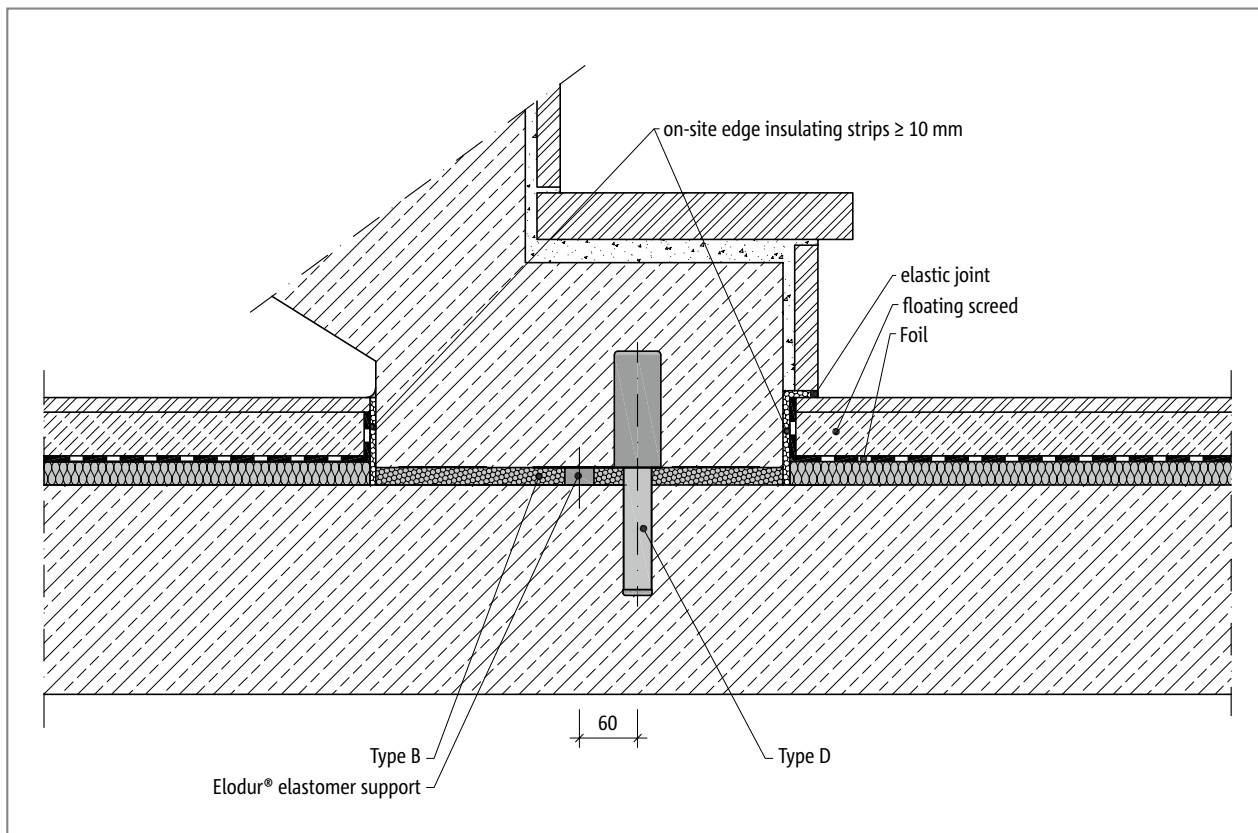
Schöck Tronsole® Type B + type D: Installation cross-section
